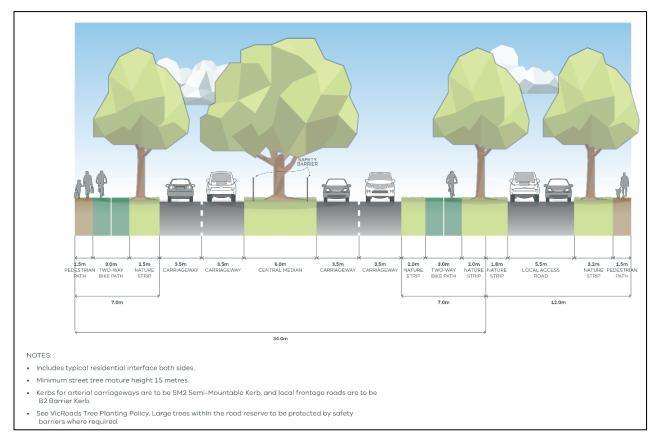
Secondary arterial cross section - four lane 34m (Source: VPA)
